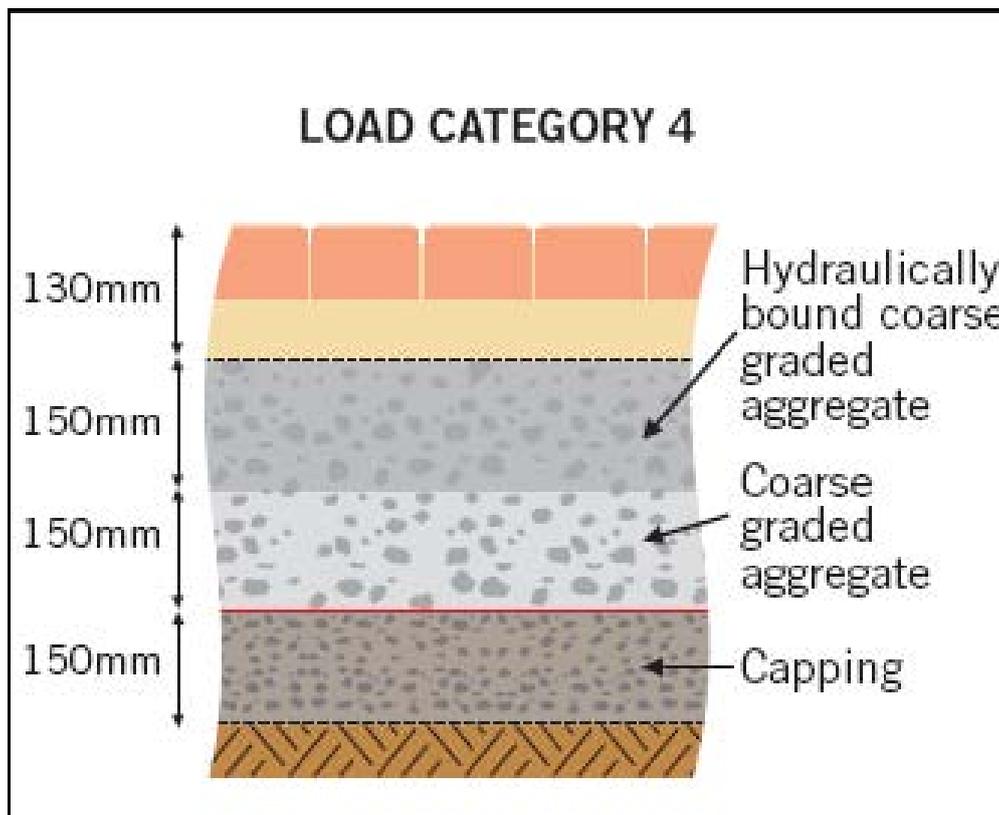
Section through a permeable surface for expected load category (Source: Interpave *Permeable pavements – guide to the design construction and maintenance of concrete block permeable pavements* dated 2010)
